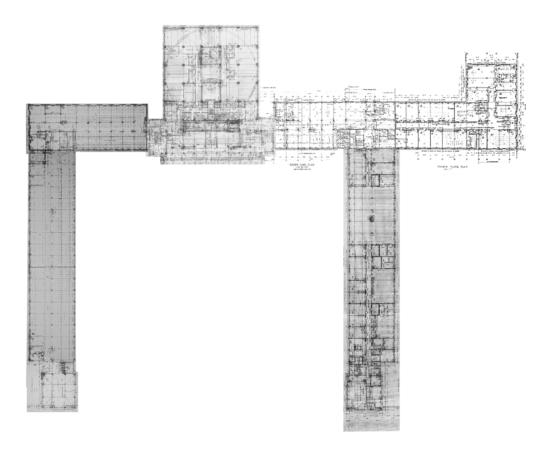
Floor Plan- Fourth Floor (Collage of separate drawings).
